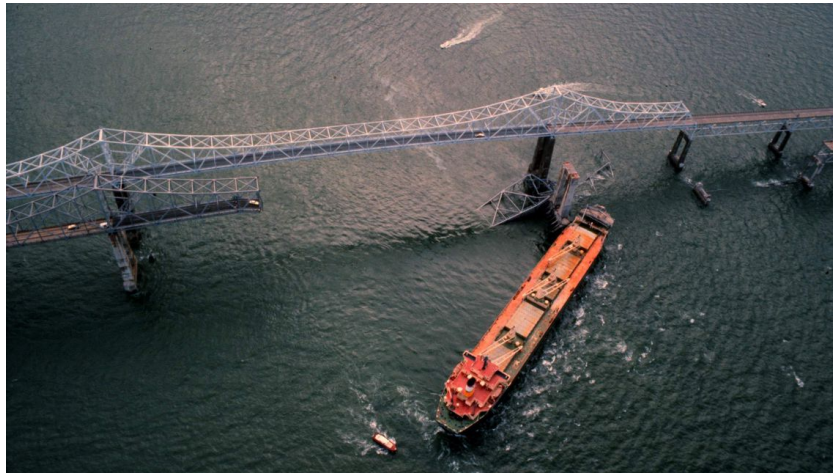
An aerial photo from May 9, 1980, shows the freighter Summit Venture after it collided with the Sunshine Skyway bridge. The bridge collapse killed 35 people. [22]
